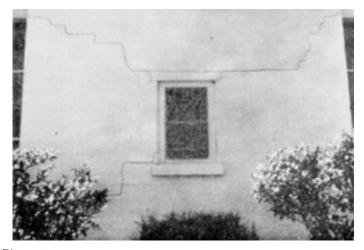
Wall of a schoolhouse built on Houston Black clay. The cracks result from the shrinking and swelling of the soil material.
